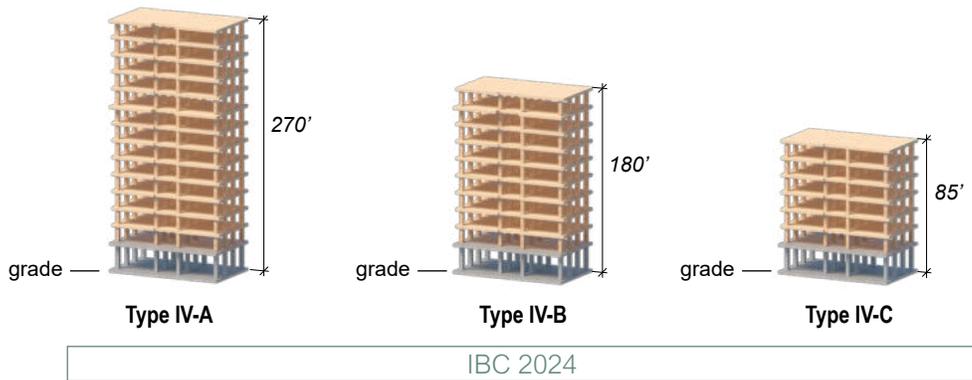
IBC 2024 Types of Mass Timber Buildings
